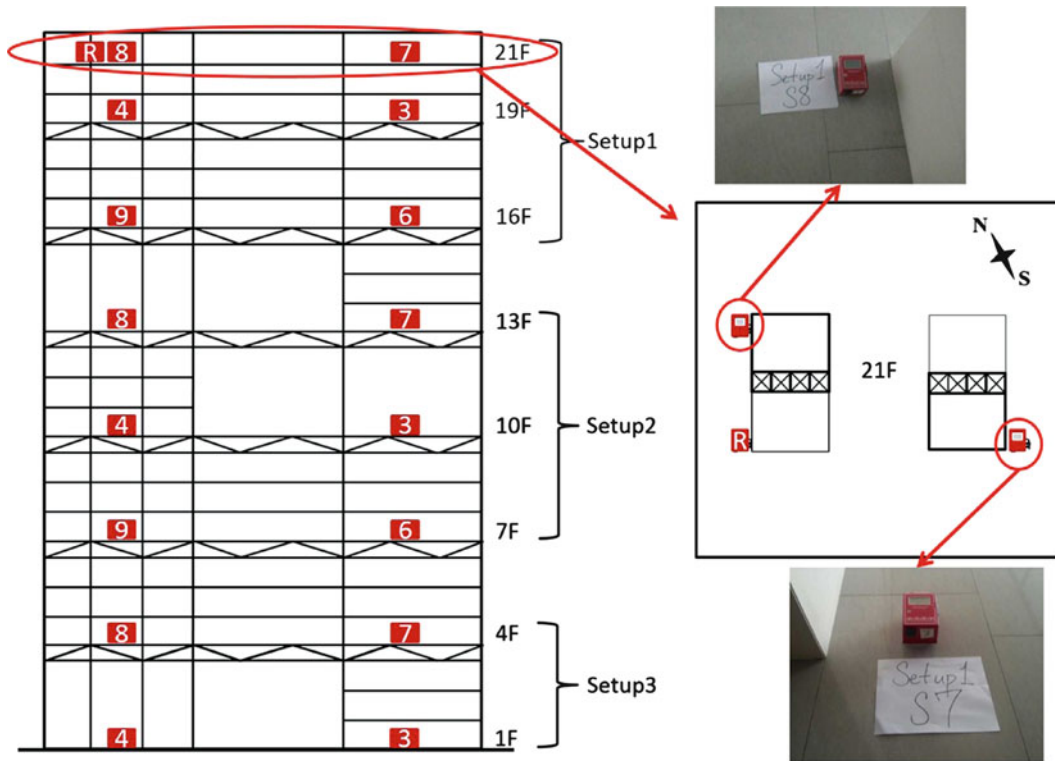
Setup plan from south elevation view (left) and plan view of 21th floor (right)
